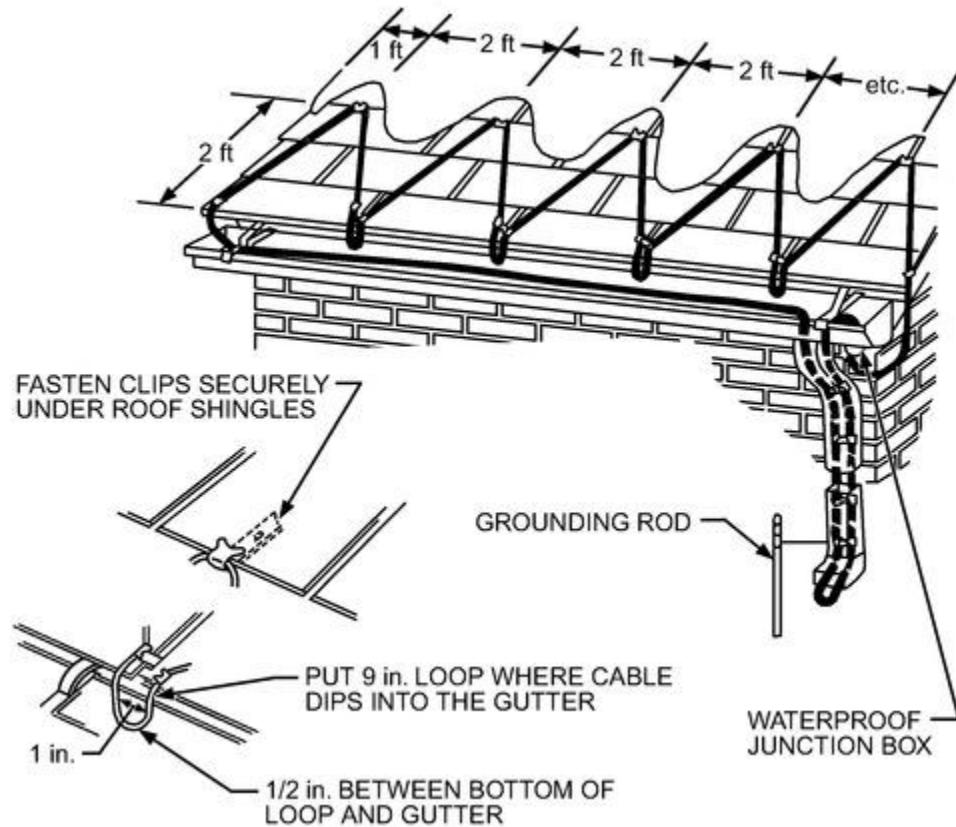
Typical Insulated Wire Layout to Protect Roof Edge and Downspout
